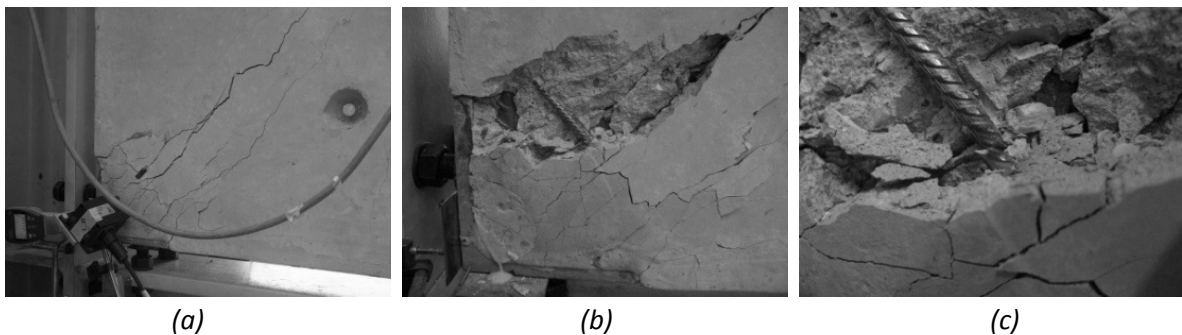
Failure panel corner (a) with concrete spalling (b) and wedge reinforcement yielding (c)
